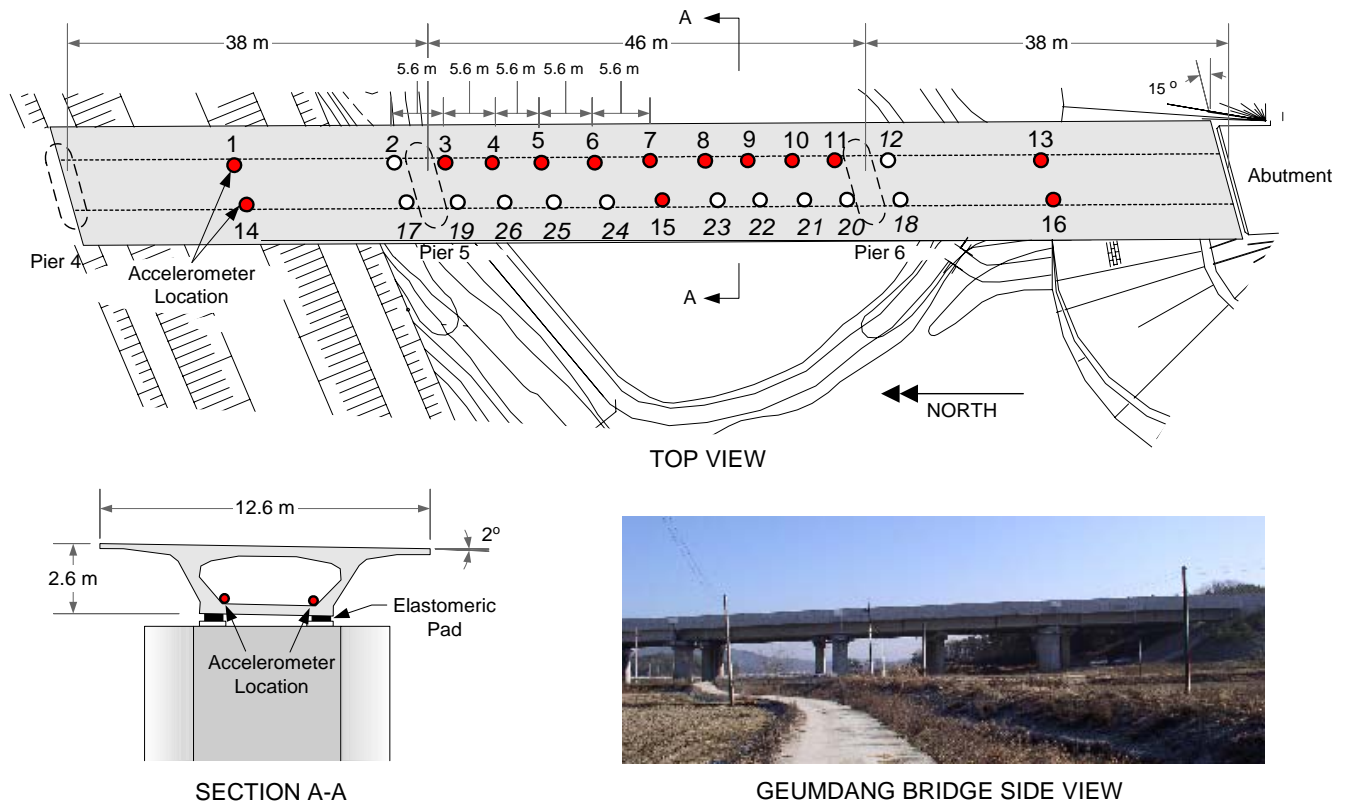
Engineering schematic of the Geumdang Bridge including the location of the instrumented accelerometers
